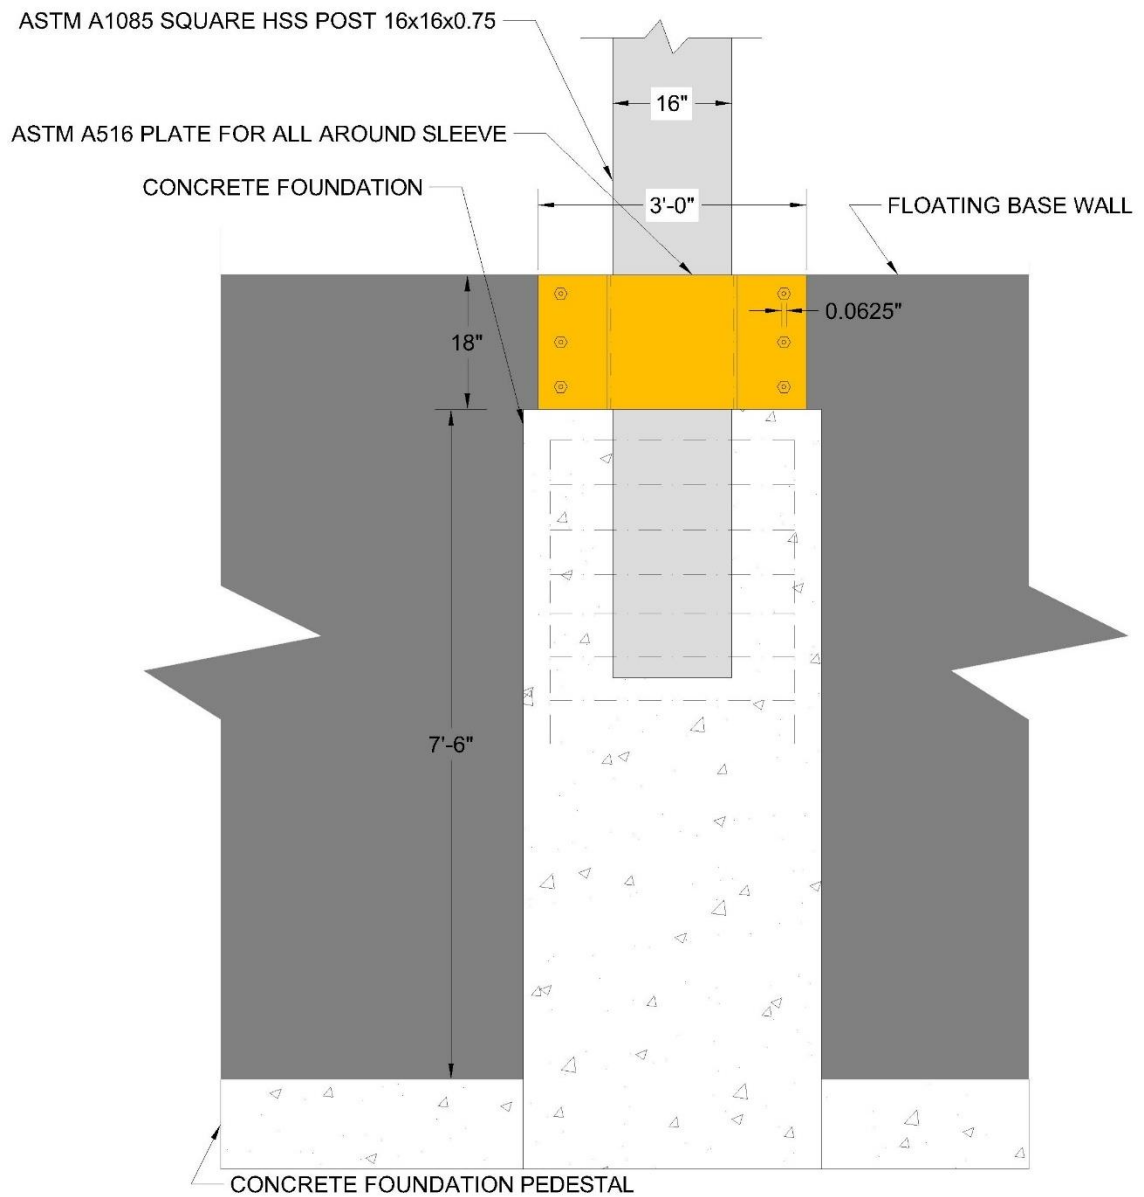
Front view of the base-post connection as well as the post-foundation connection
